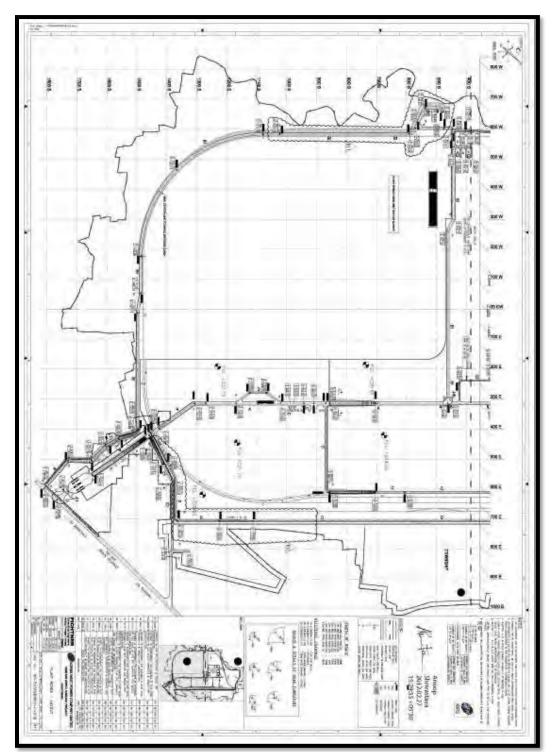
LAYOUT PLAN OF REGL'S TPP
